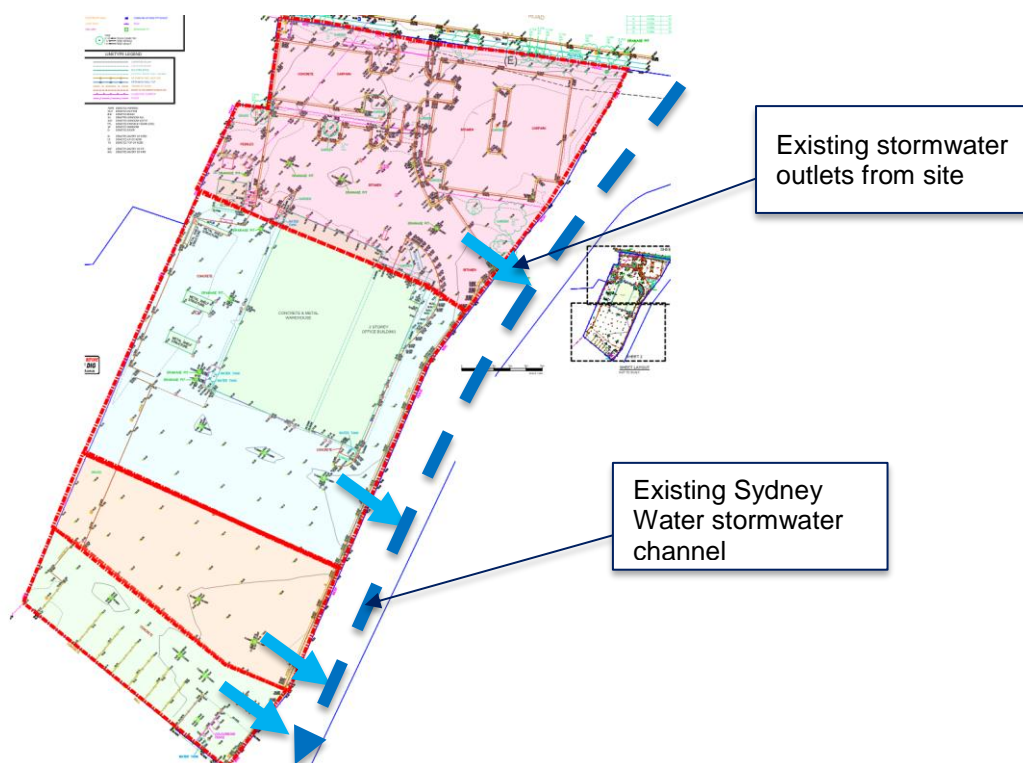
Approximate site sub catchments plan (73 Gardeners Road)
